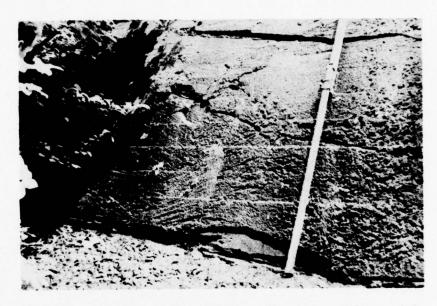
Leakage and spalled surface on spillway right side.
